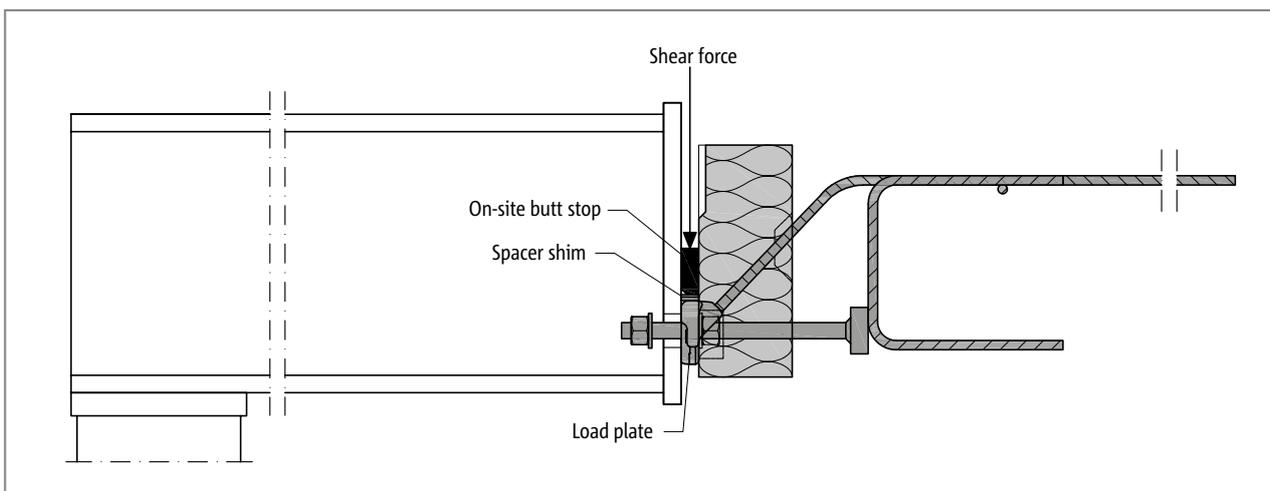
Schöck Isokorb® T type SQ: On-site butt stop for transferring shear forces
